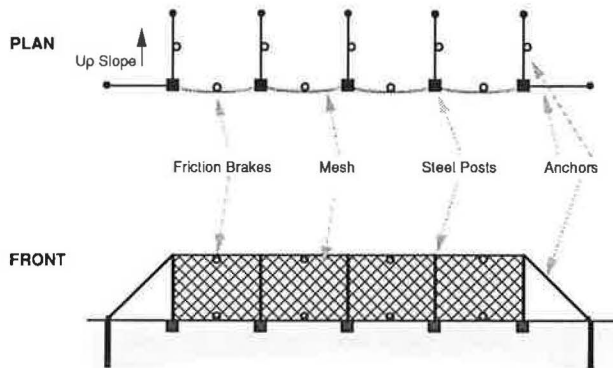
Typical plan view and front view of Brugg rockfall net.
